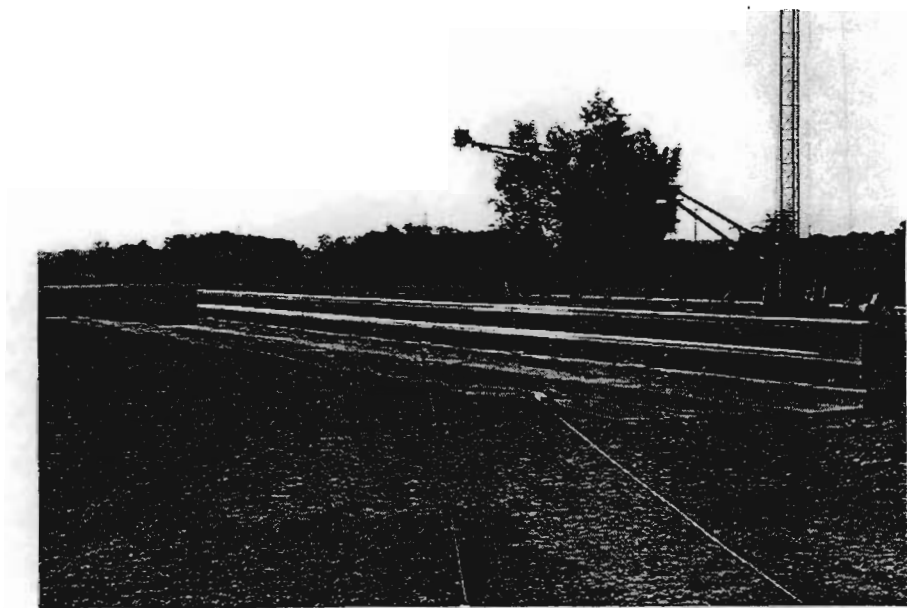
Wyoming TL-4 bridge railing test installation before test 472610-2.
